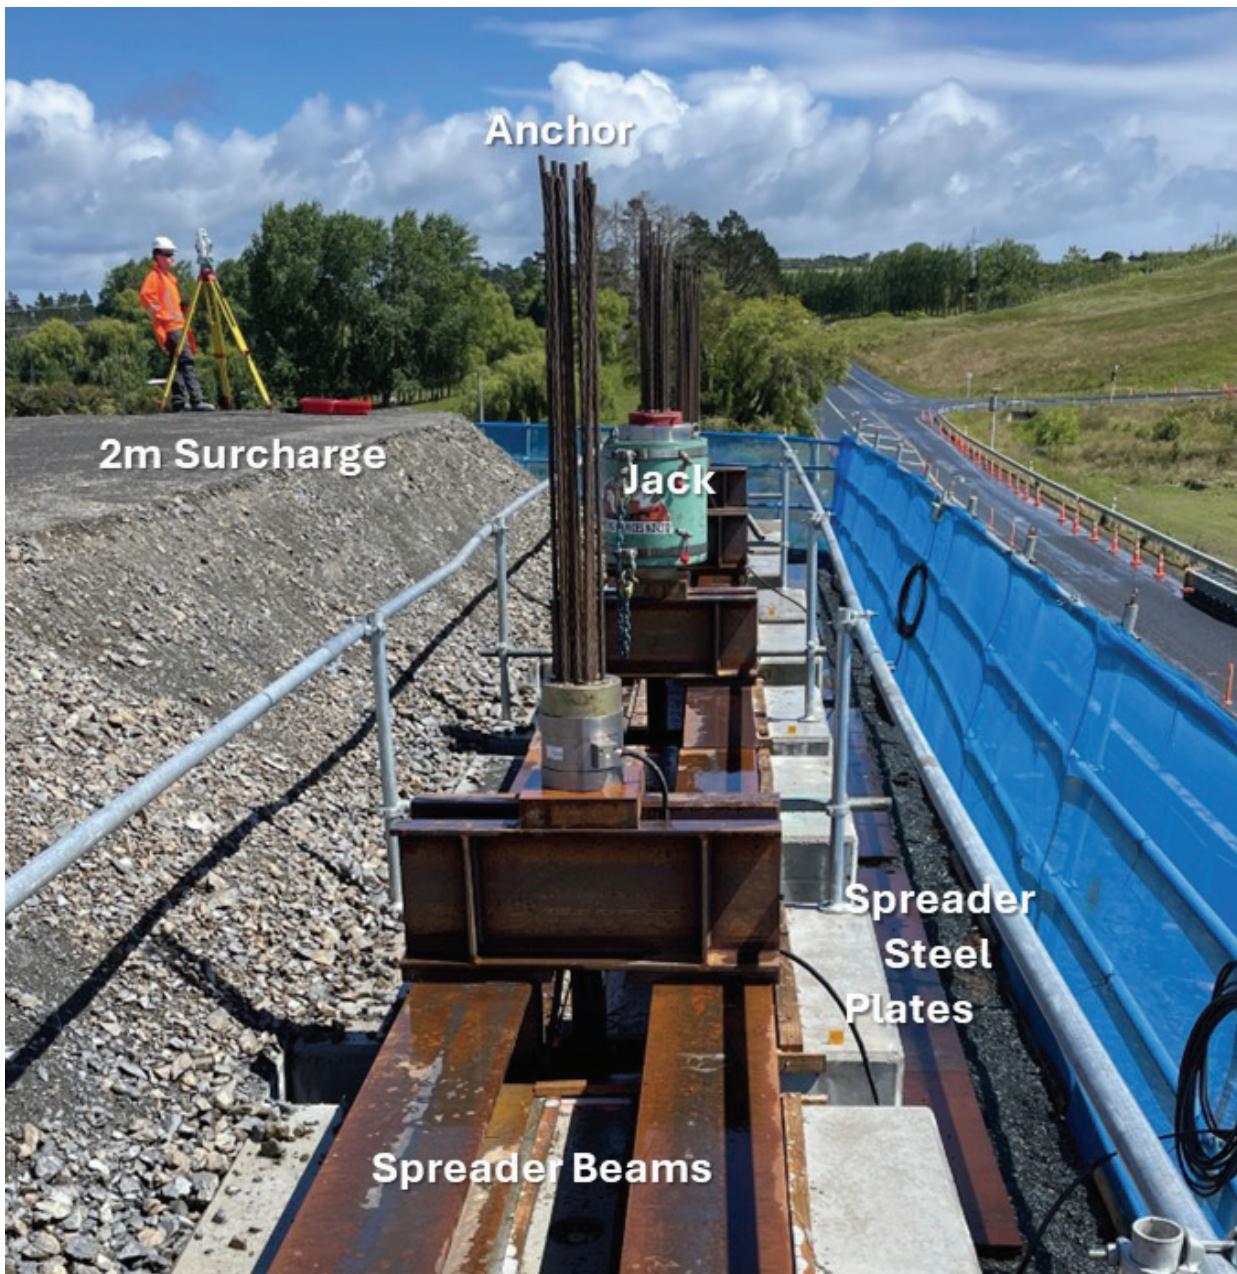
Eastern abutment at full height with prestressing and 2m of conventional surcharge in place
